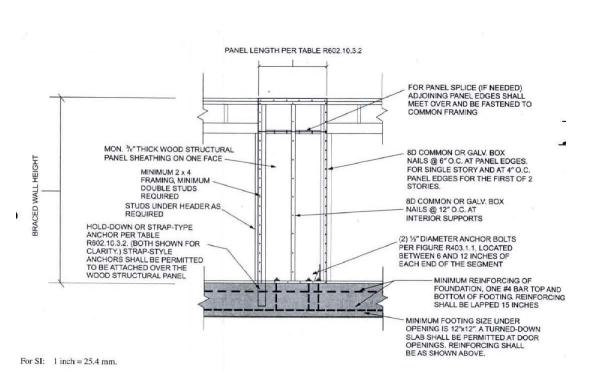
10 3 2 ALTERNATE BRACED WALL PANEL
